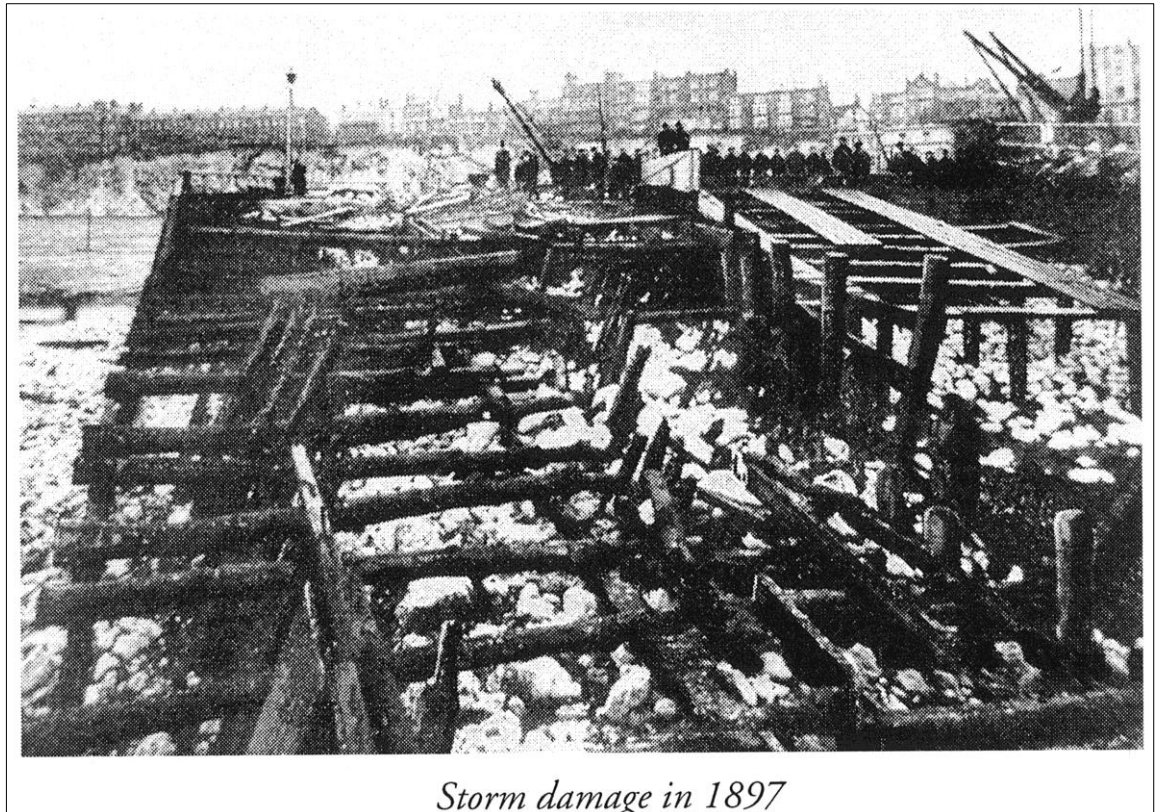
, Broadstairs. Pier frame exposed by storm damage, 1897. (reproduced from: Simmonds 2006)
